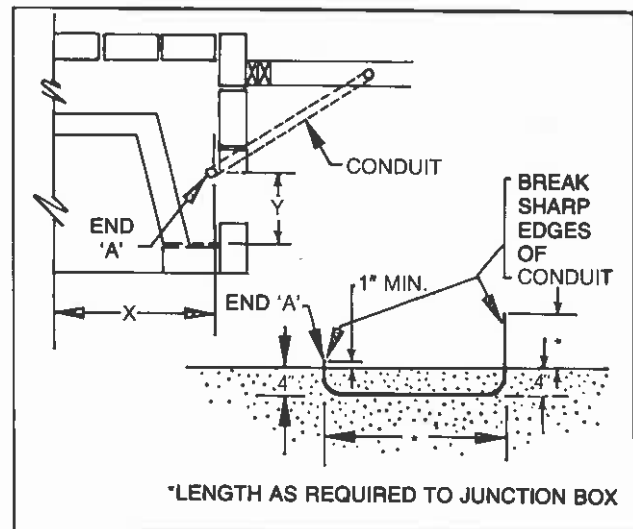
If circulator fans are used, install conduit as shown in foundation.
